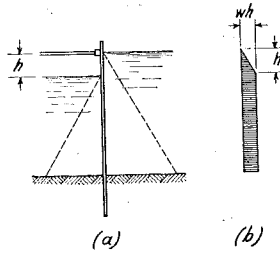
UNBALANCED HYDROSTATIC PRESSURE ON SHEET PILING AS THE WATER LEVEL IS LOWERED AND THE BRACING IS BEING FIXED IN SUCCESSIVE STAGES.
